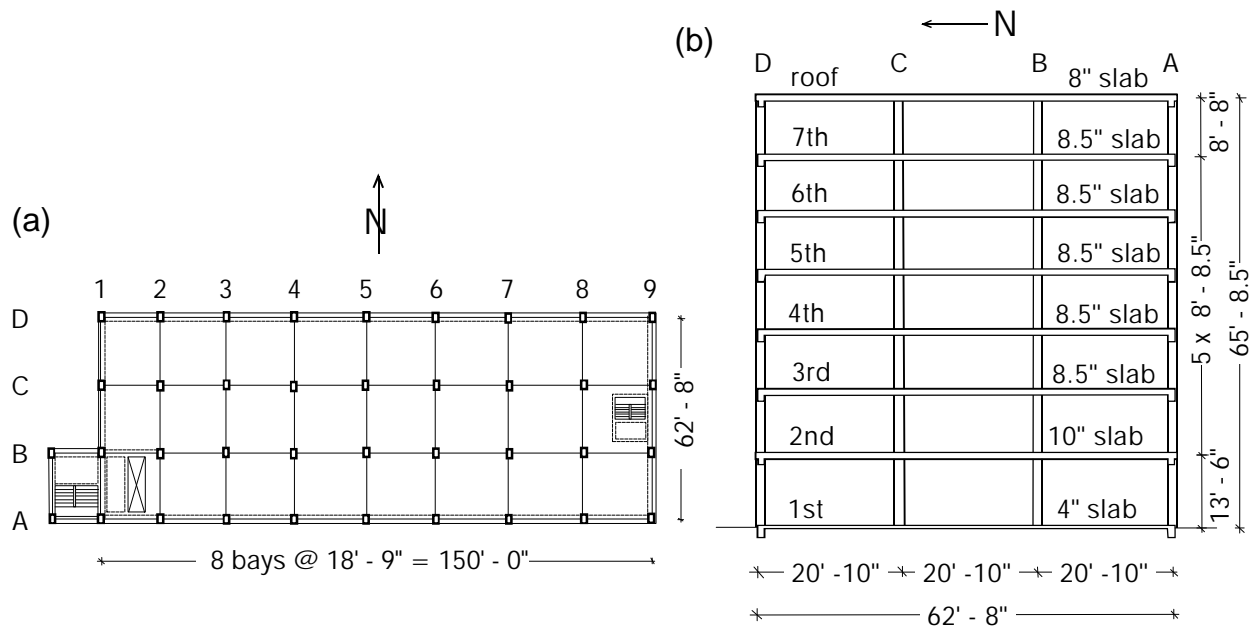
(a) A typical floor plan, and (b) a typical transverse section for the 7-storey hotel.
